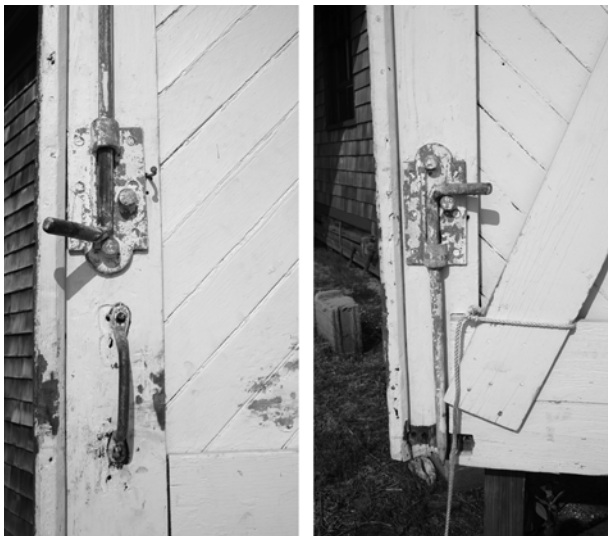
View of typical upper (left) and lower (right) sliding bolts on boat room doors. (T. Jones, NPS, 2005)
